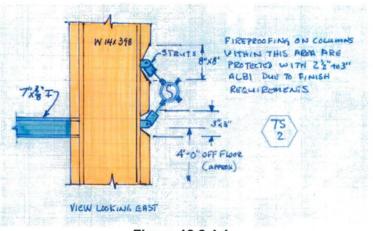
Typical Strut or Snubber Attachment Omission
